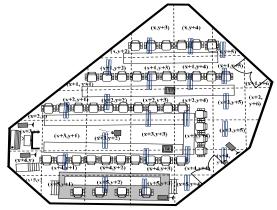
The floor plan of room 2.2 in the head office Faculty of Engineering Universitas Gadjah Mada.
